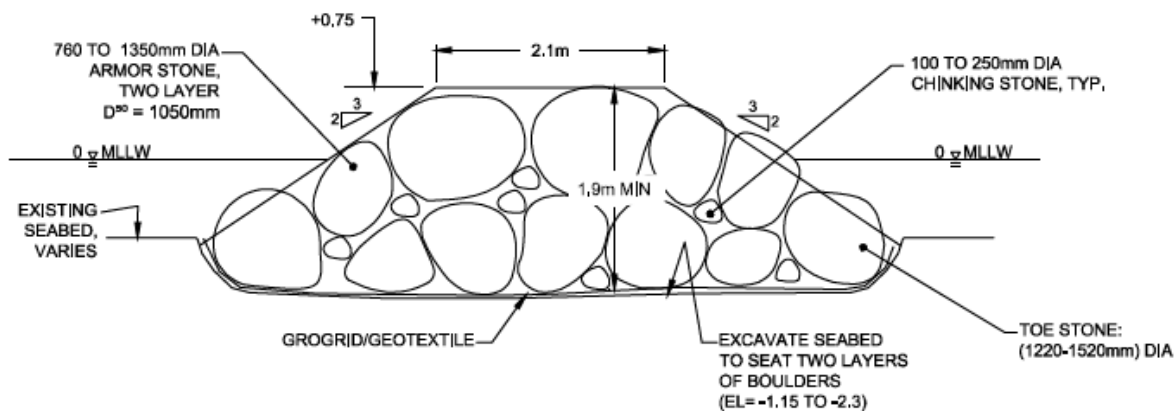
Typical groyne section (Source: Olsen, 2019)
